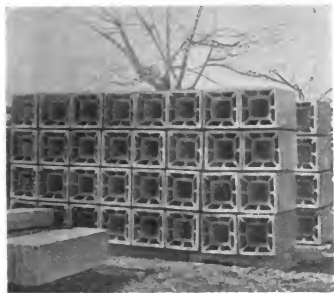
A STACK OF FINISHED CONCRETE CHIMNEY UNITS.
